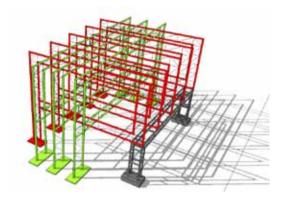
diagram of secondary steel trusses spanning the length of the structure. trusses are supported on both sides.
